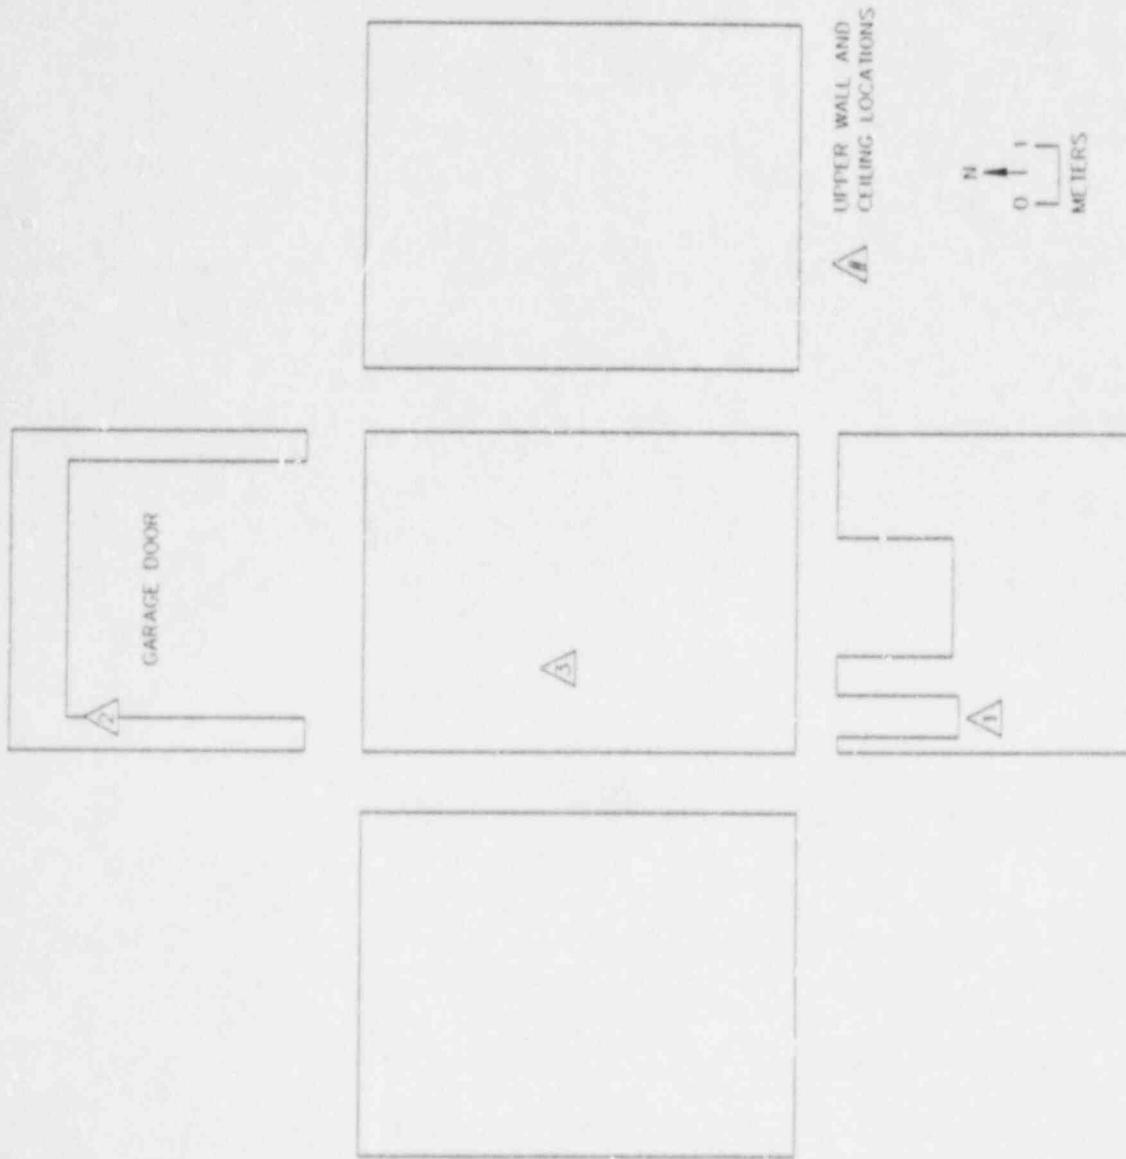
Drying Oven Showing Locations of Upper Wall and Ceiling Single-point Measurements
